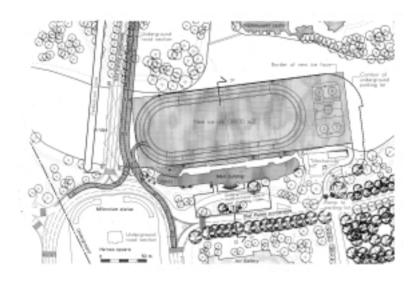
Layout of the Ice Rink and surroundings – renewal plan
